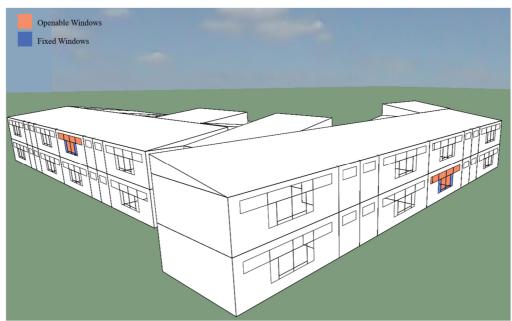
Openable area of each window in classroom 7 (Ground floor) and classroom 11 (First floor)
